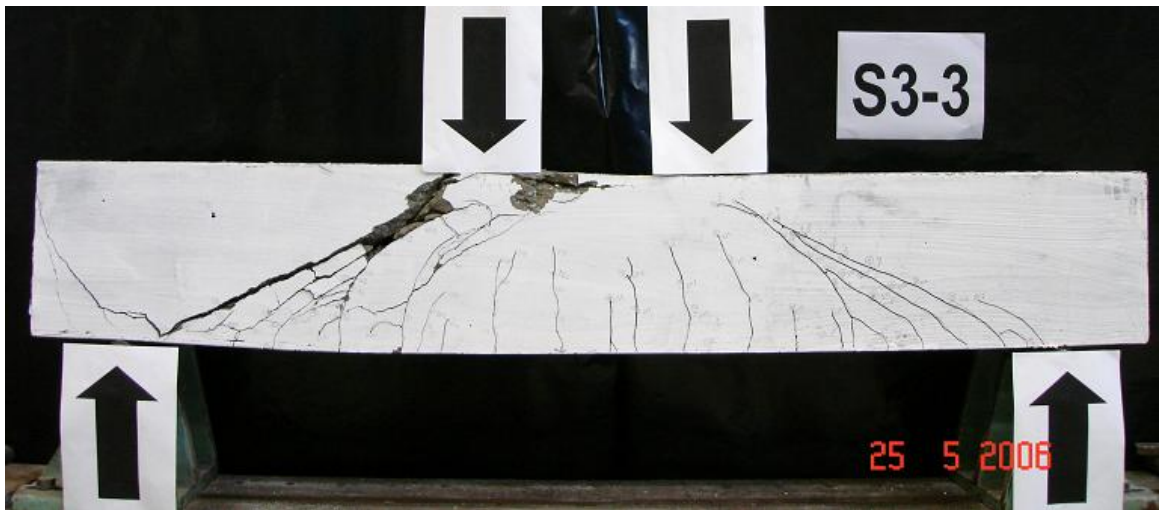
Overall Crack Pattern for Beam 3-3 (Back Face)
